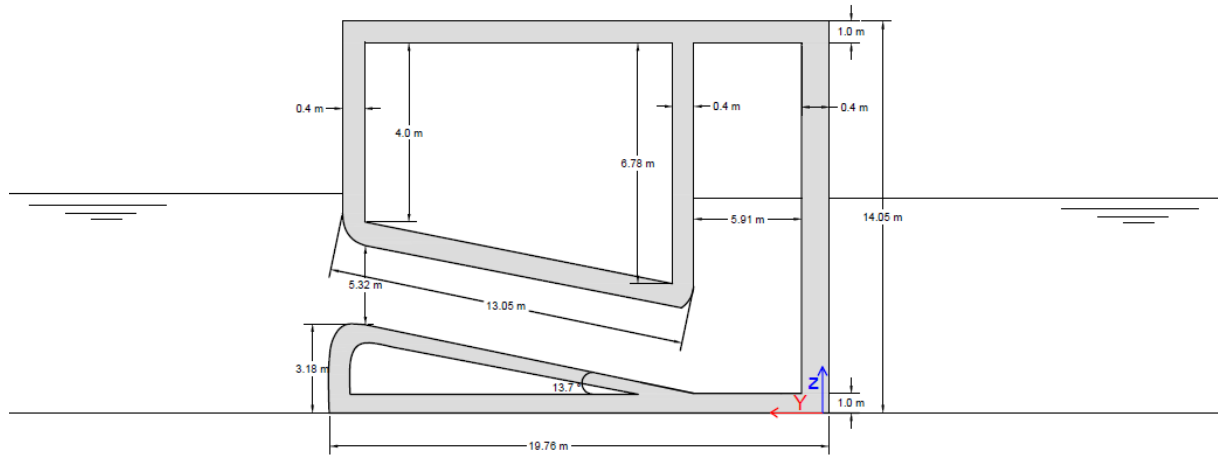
Side view dimensions of the modified design – Autodesk AutoCad
